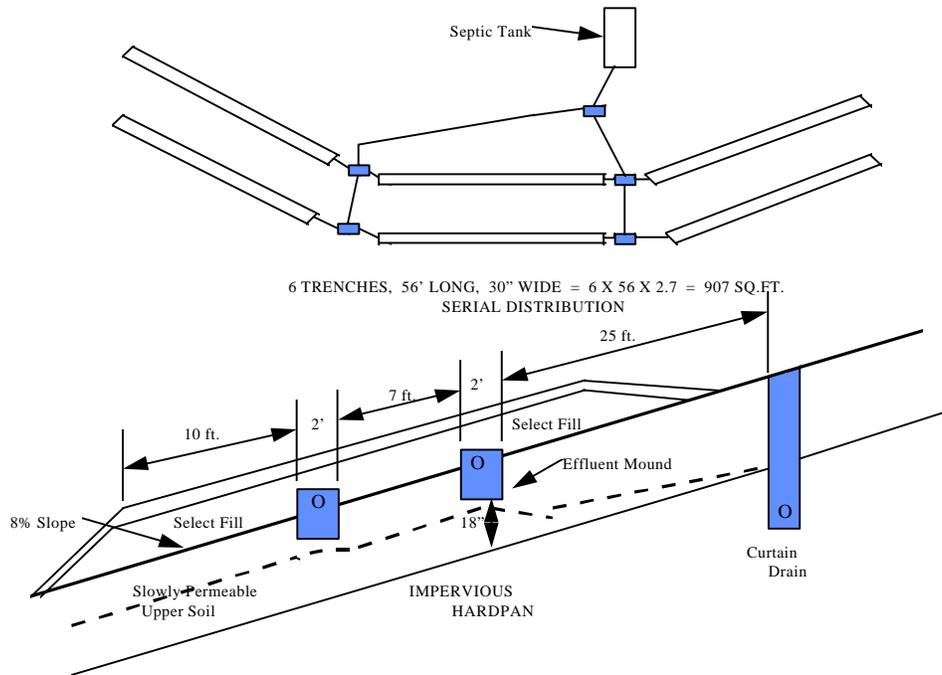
Trenches In Slowly Permeable Soil Spread On Slope
